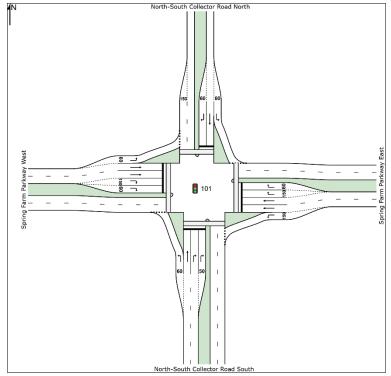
Indicative Spring Farm Parkway/ North-South Collector Road intersection layout
